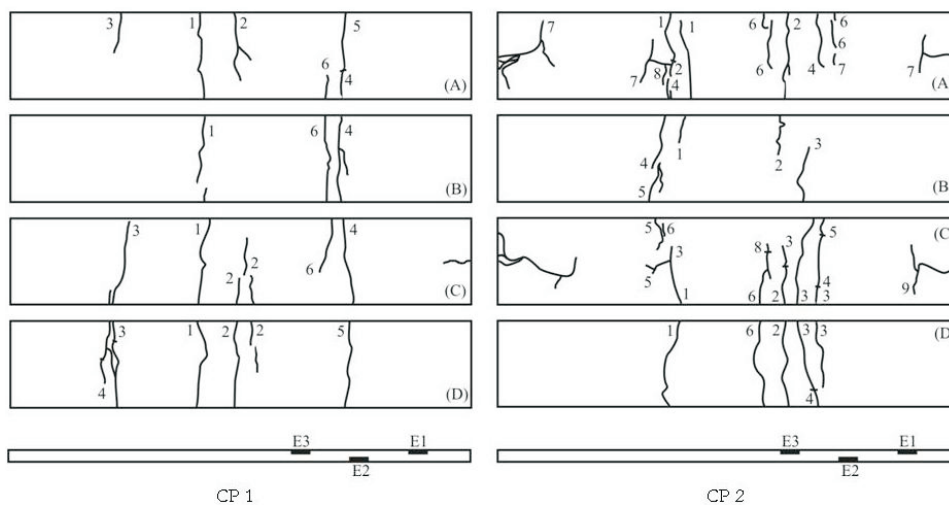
Final crack patterns in four faces of tension specimens made of concrete without mineral additions reinforced with 0.75% of fibers
